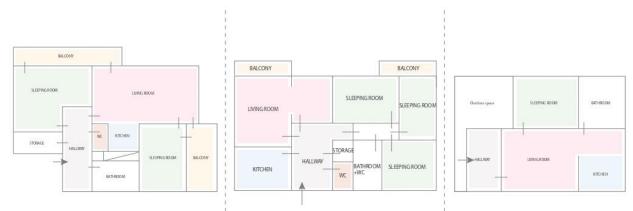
Housing layout for typical Dutch, Syrian, and Eritrean houses.
